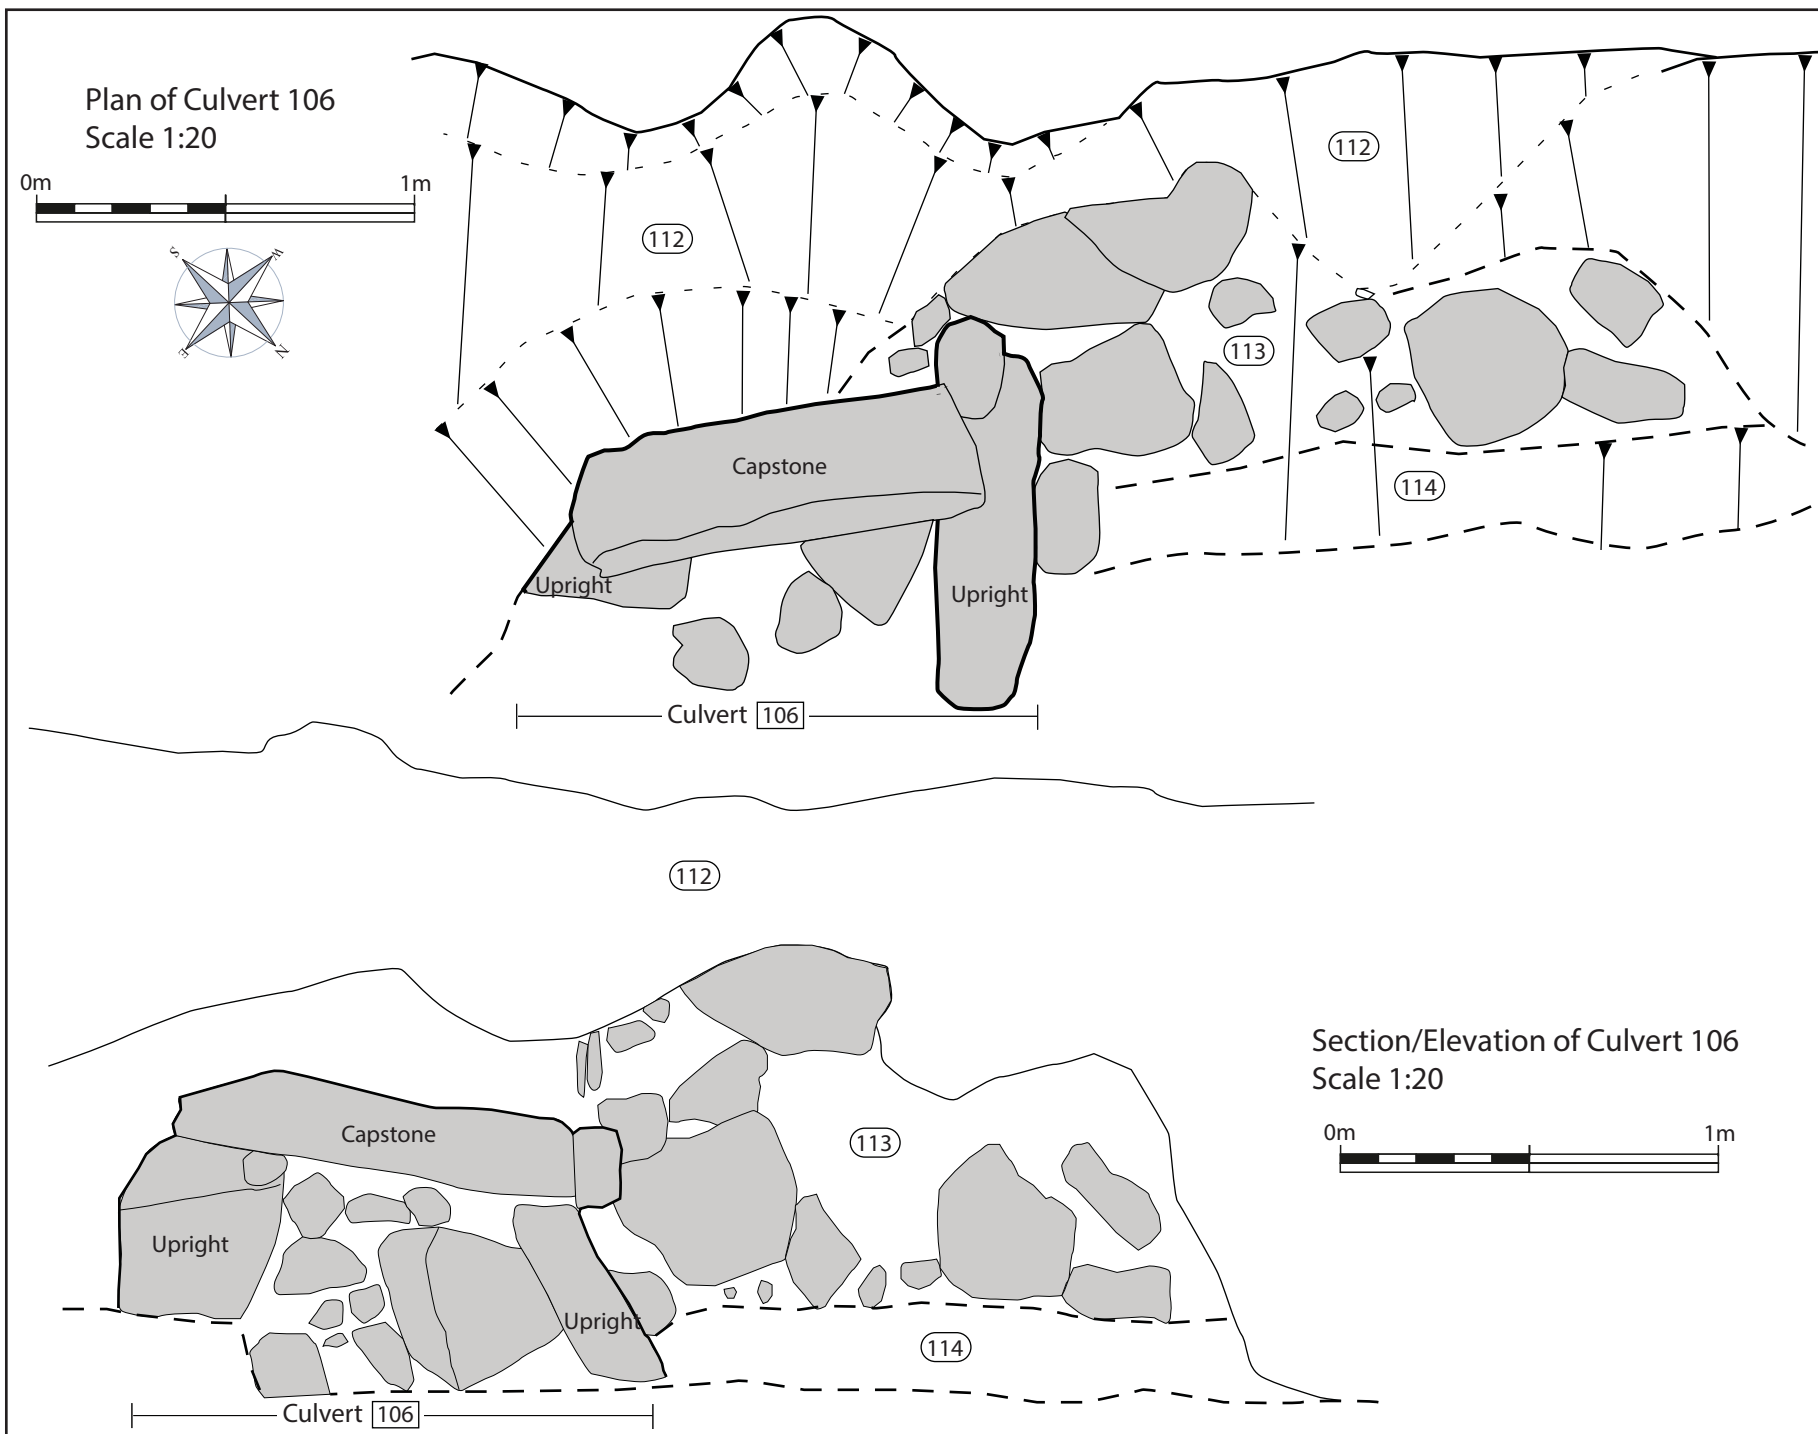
Plan and section of culvert 106 and surrounding deposits.
